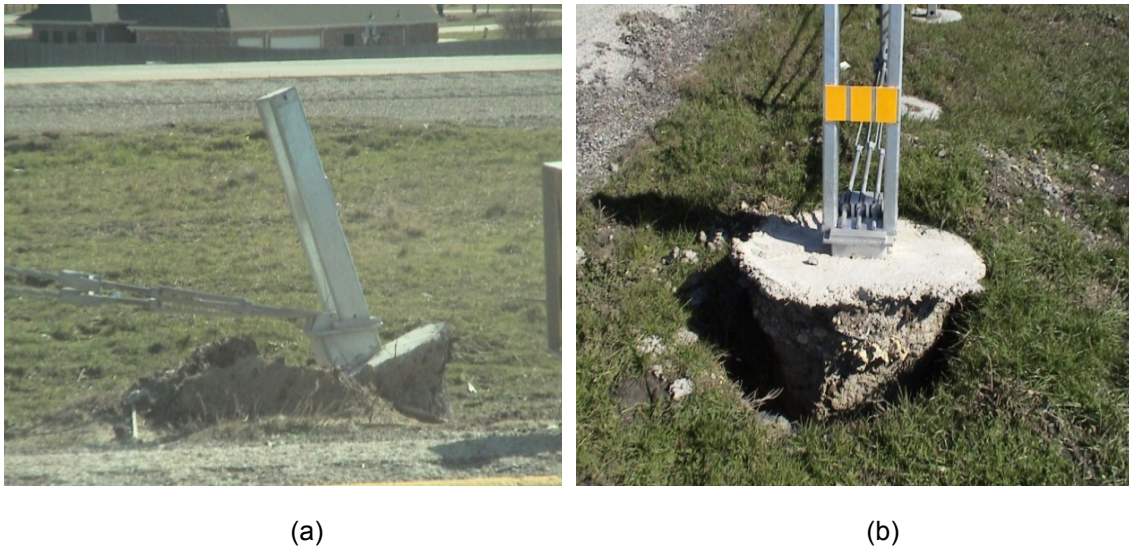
Typical Foundation Failures on IH 20 Westbound (a) Sta. 903+00, Plan Sheet 61 and (b) Sta. 973+44, Plan Sheet 45 for CSJ: 0495-01-052
